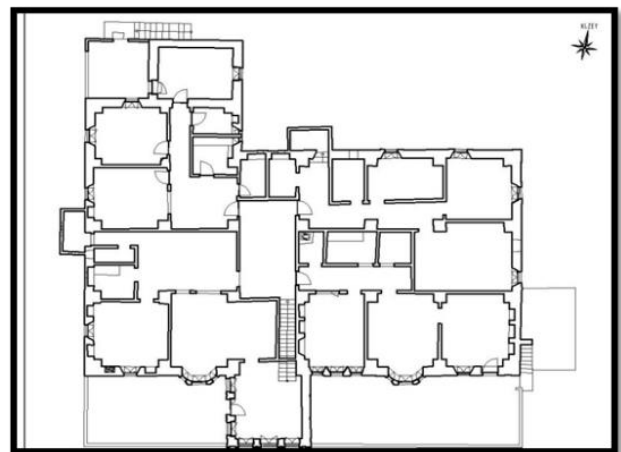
Plan of the First Floor (Mardin Metropolitan Municipality,2022)
